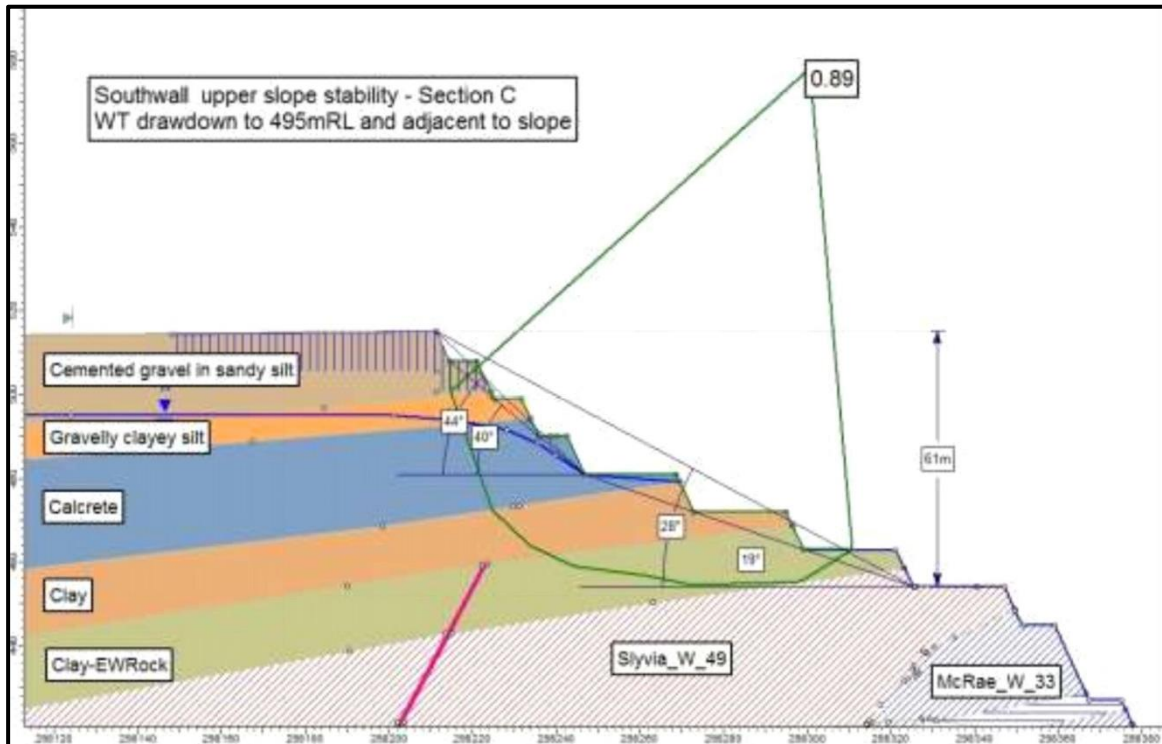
Geotechnical Slope Stability Section C (Snowden 2012)
